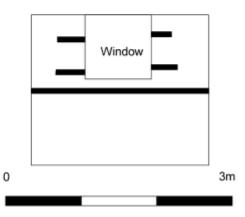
Exposed timberwork on the ground and first floors (scale 1:50)
